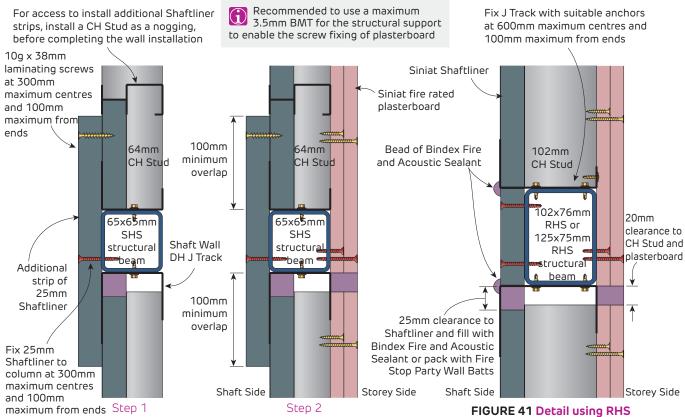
Detail using SHS Beam with 64mm CH Studs
